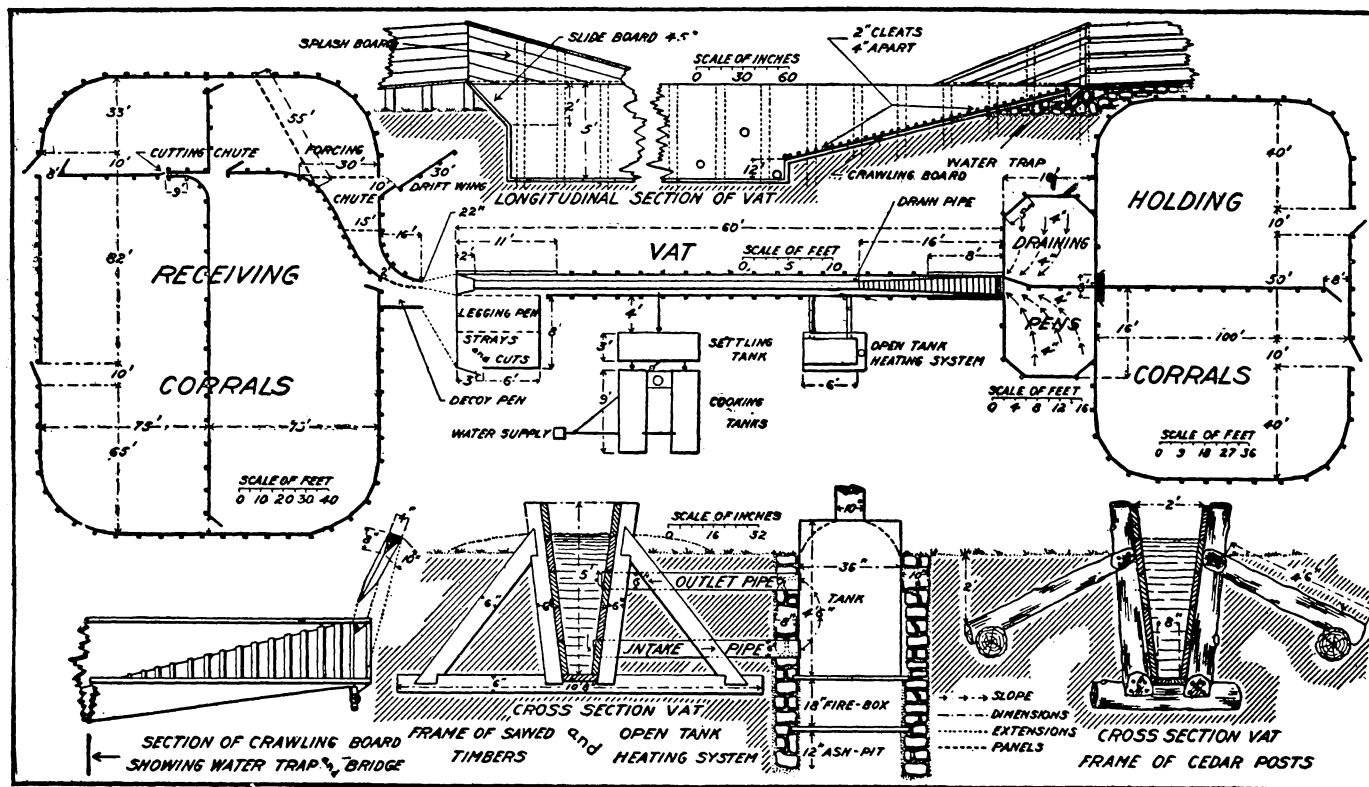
Plan of sheep-dipping plant; wooden vat.
